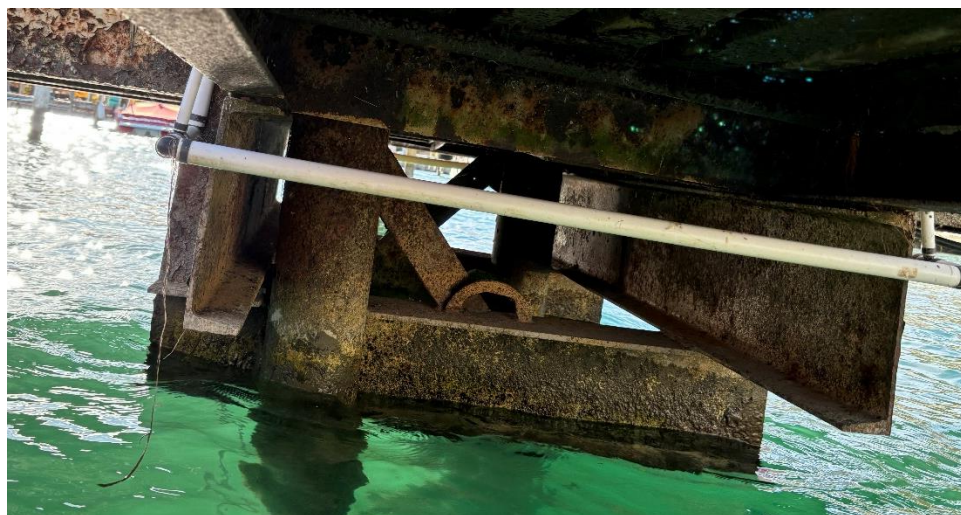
Abandoned pile with two new piles to support pier (Pier 4).
